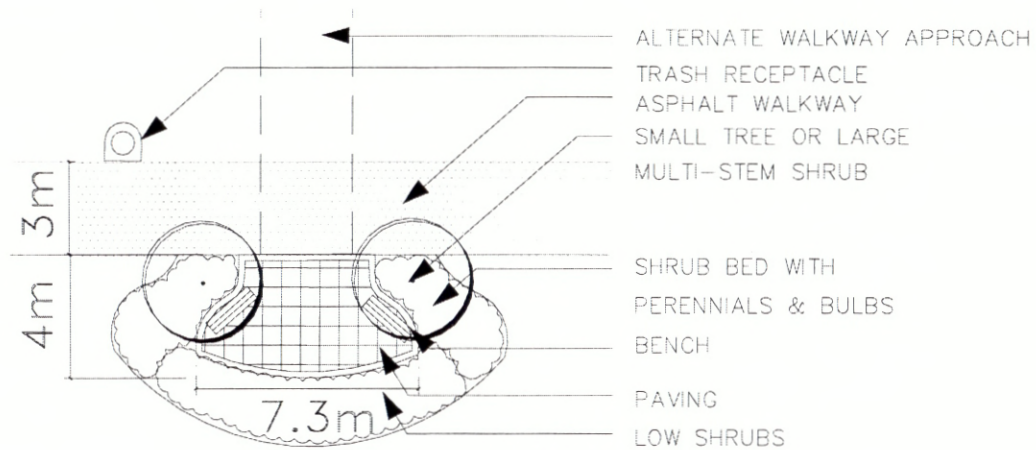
TYPICAL LOOKOUT (MAJOR POINT OF INTEREST)
